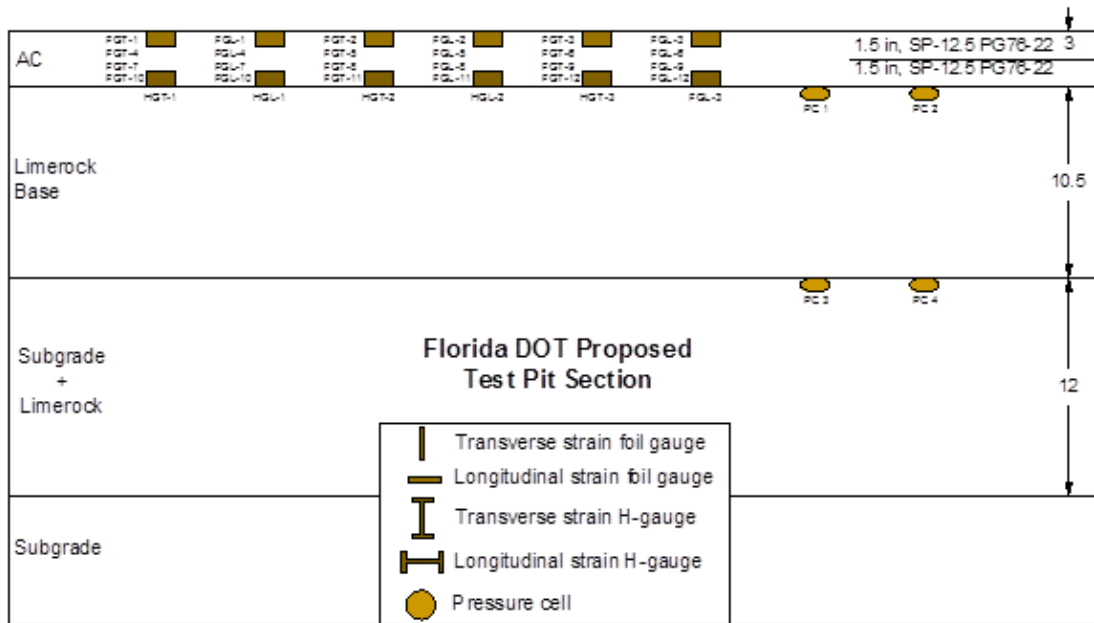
Illustration. Profile view of pavement structure and instrumentation for the test pit section.
